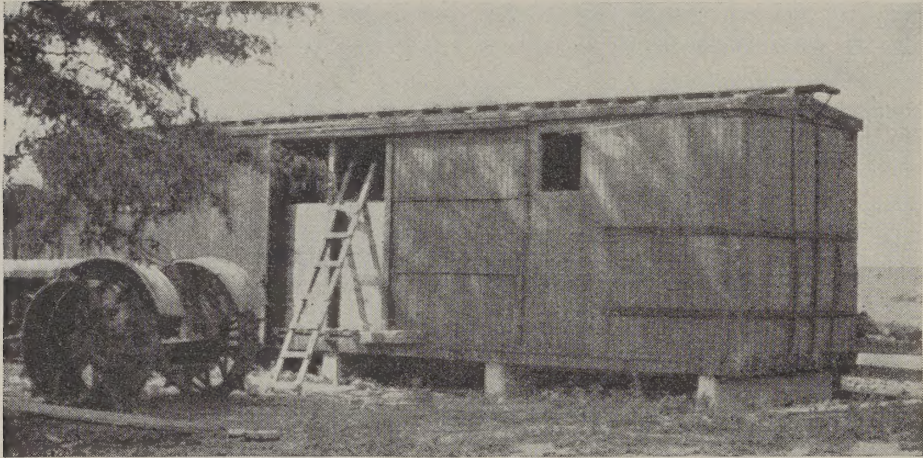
A substantial farm storage, total capacity about 2,000 bushels. Note concrete foundations and good clearance above ground. A door for the filling opening is needed. If the space between the doors were left empty it would be easier to move the grain in case of heating or other trouble.
